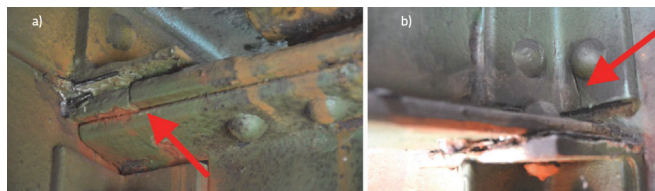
Typical failures of stringer and crossbeam joints: (a) cracked continuity pad of the stringer's upper flange; (b) crack in the connecting Angle
